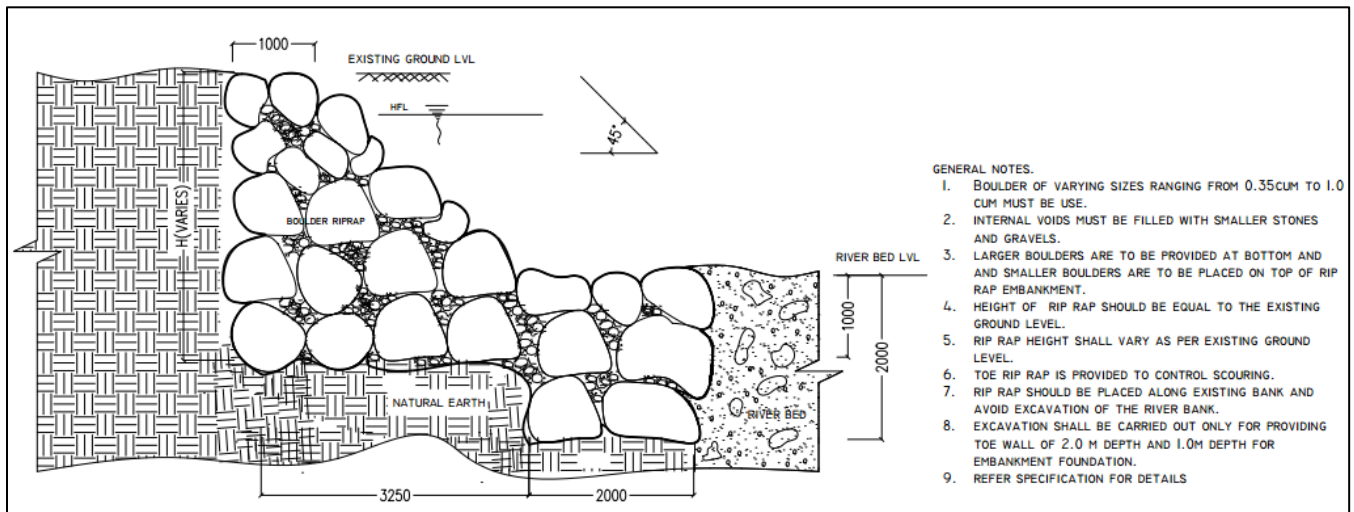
The proposed sectional view of designed Riprap structure at Zomlithang area
